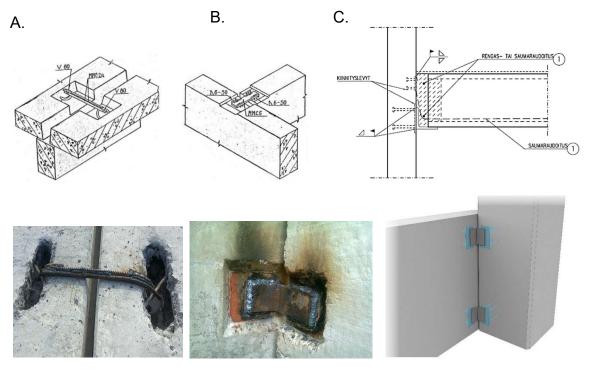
A. Welded joint with rod (17); B. Welded joint with plate (17); C. Welded joint with anchor plate (8)
